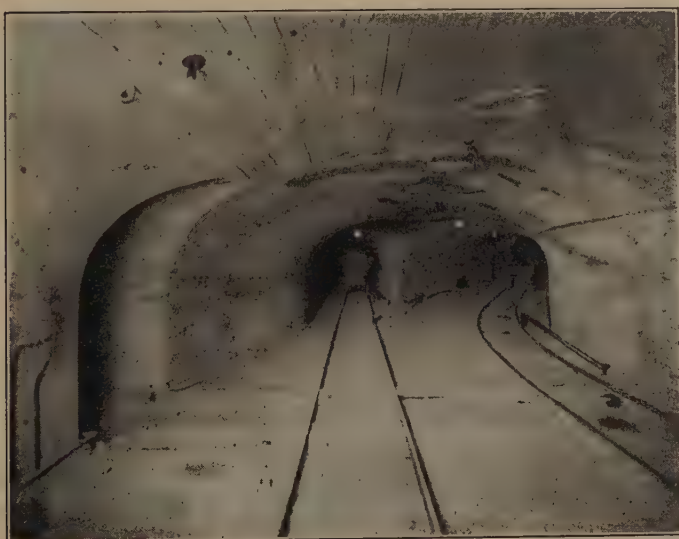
CONCRETED HAULAGEWAY, ARCH DESIGN.
